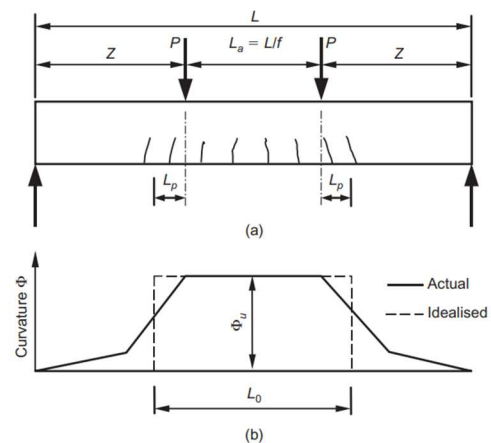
A simply supported prestressed concrete beam with unbonded tendons under two symmetrically disposed point loads: (a) arrangement of loading; (b) actual and idealised curvature distribution along the beam
